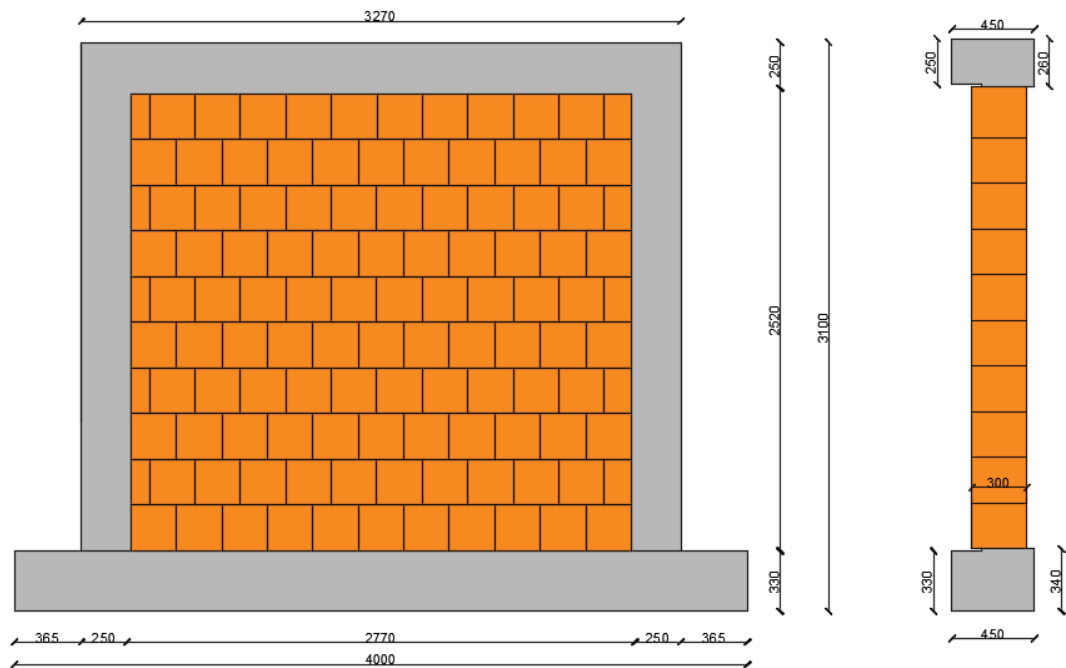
Front and side view of frame and wall specimens for tests T1 and T2
